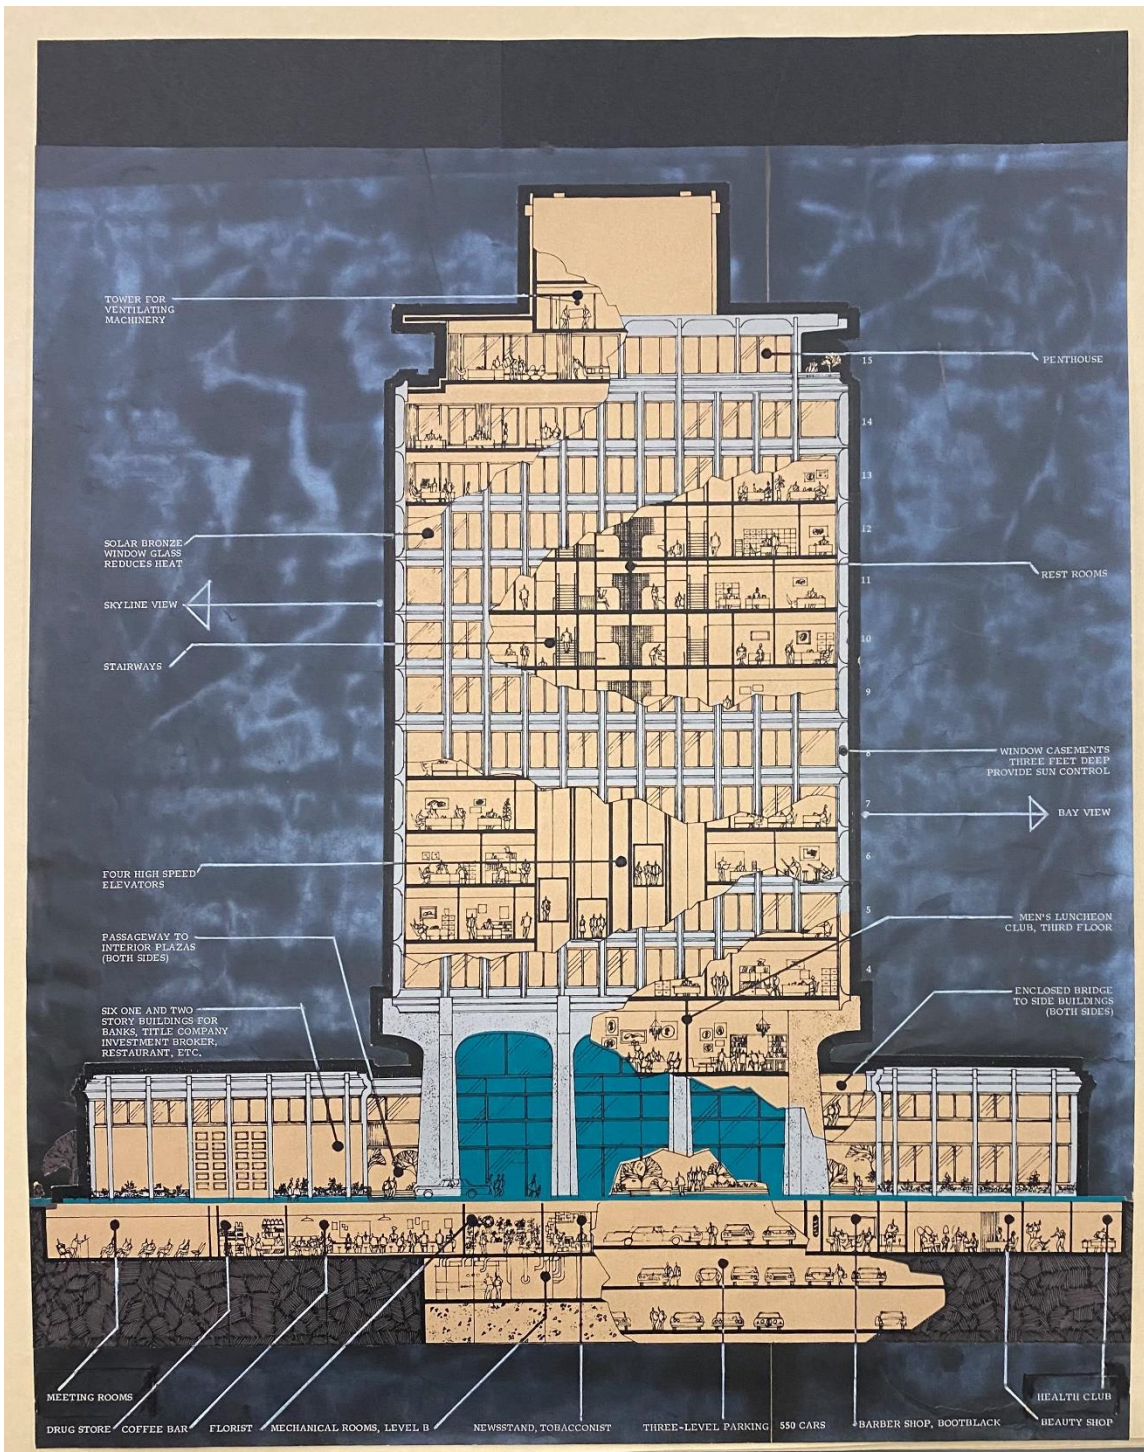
Section-elevation drawing by Maule of the three constructed buildings at Palo Alto Office Center. Source: University of California, Berkeley, Environmental Design Archives.
